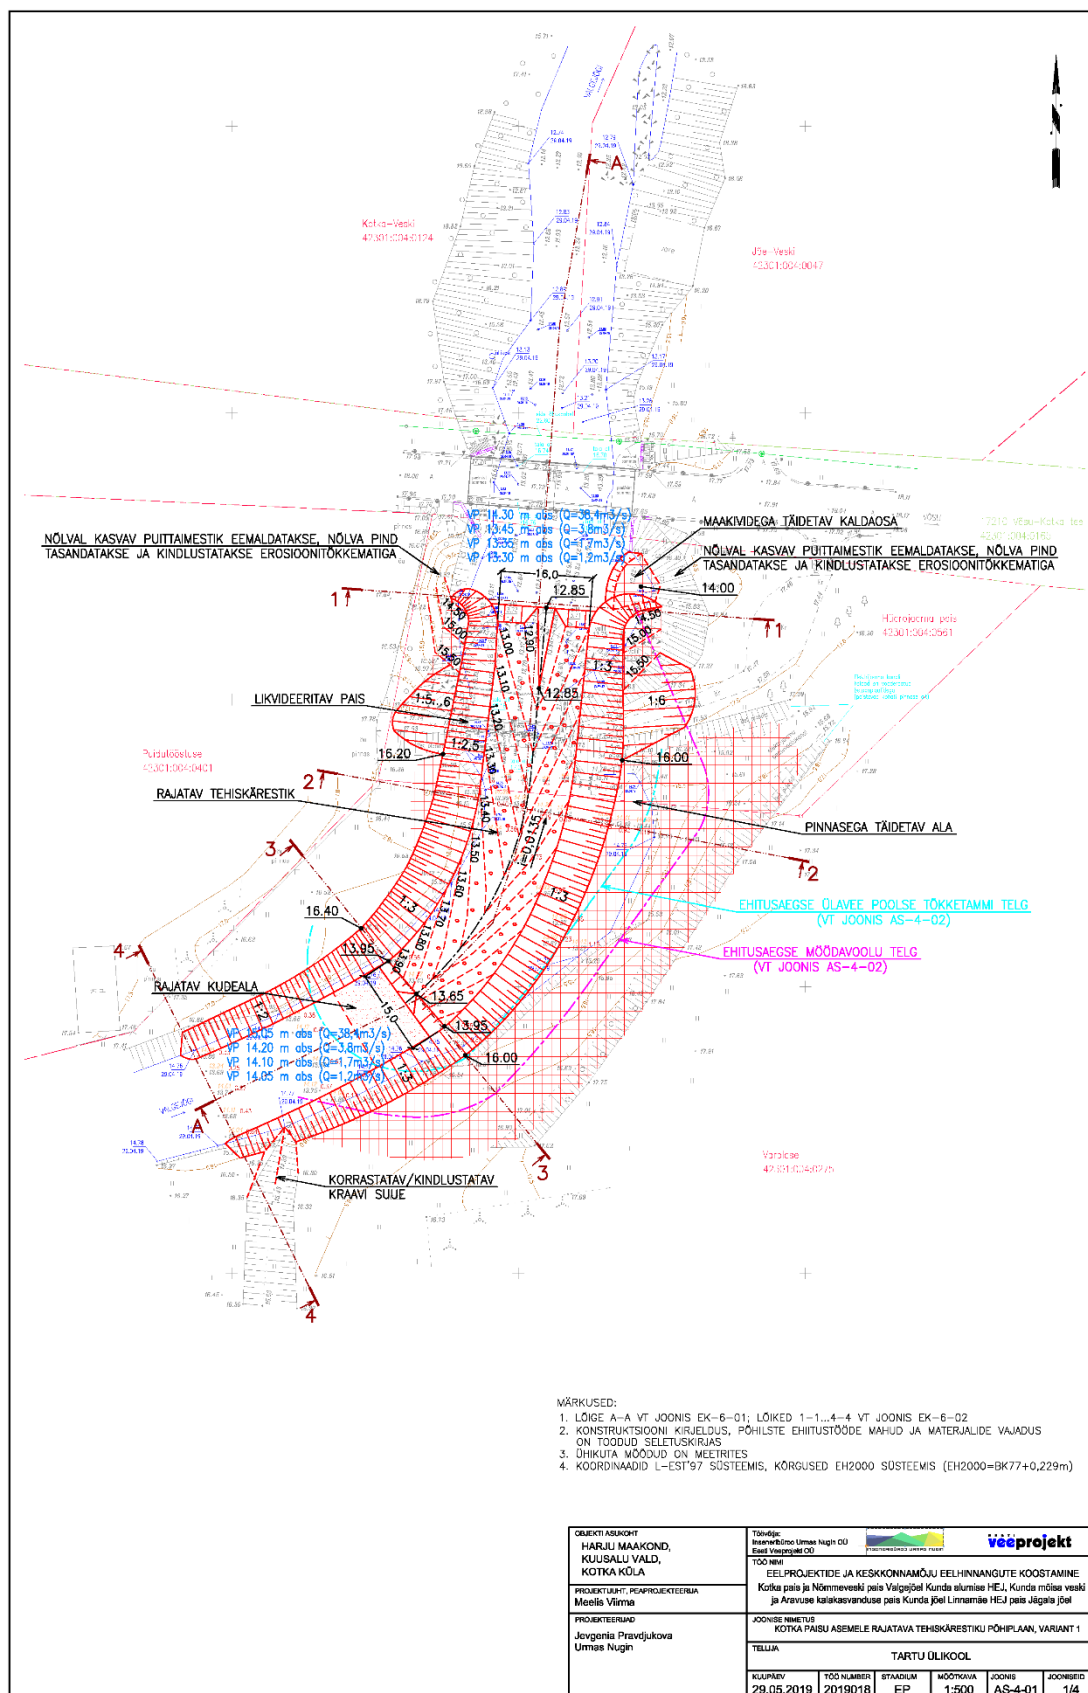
Design drawing (top view) of the first dam removal alternative for Kotka dam.
